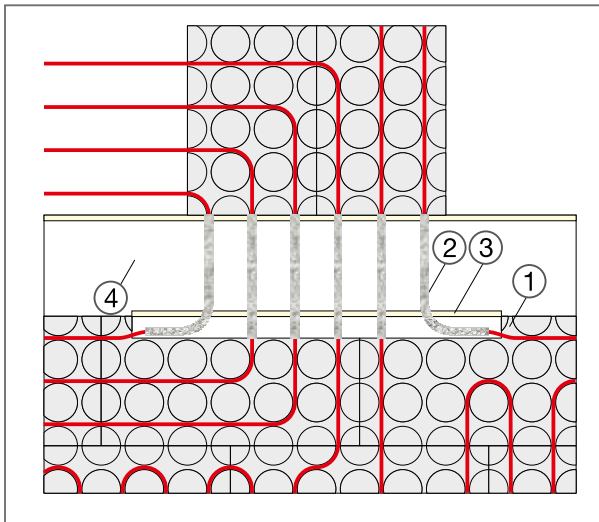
Section: Floor sub-construction with rigid foam supporting panel on level, solid under-ground
